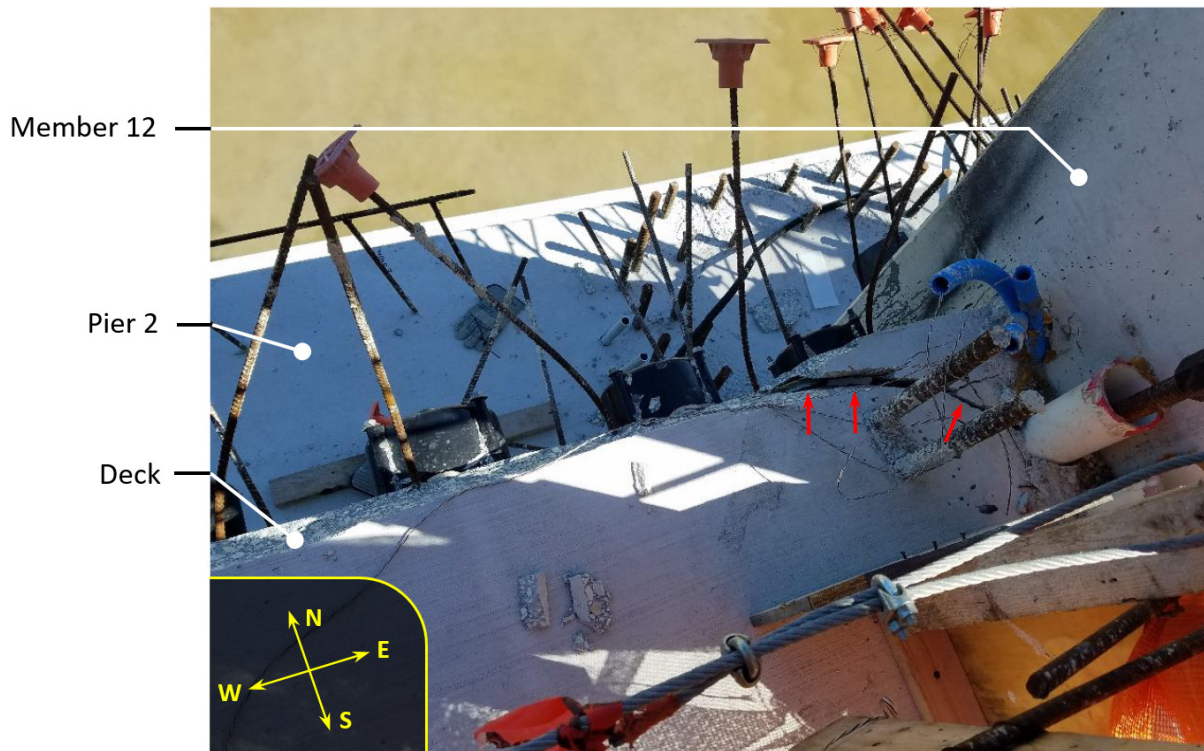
Photograph showing the north end of deck on west side of truss member 12 on March 15, 2018 at 10:55 a.m. Corresponds to Bridge Factors Factual Report Photo 104.
